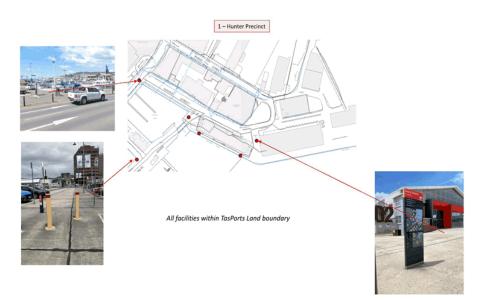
Specific location of proposed Water Supply Facilities around Hunter Street precinct.
